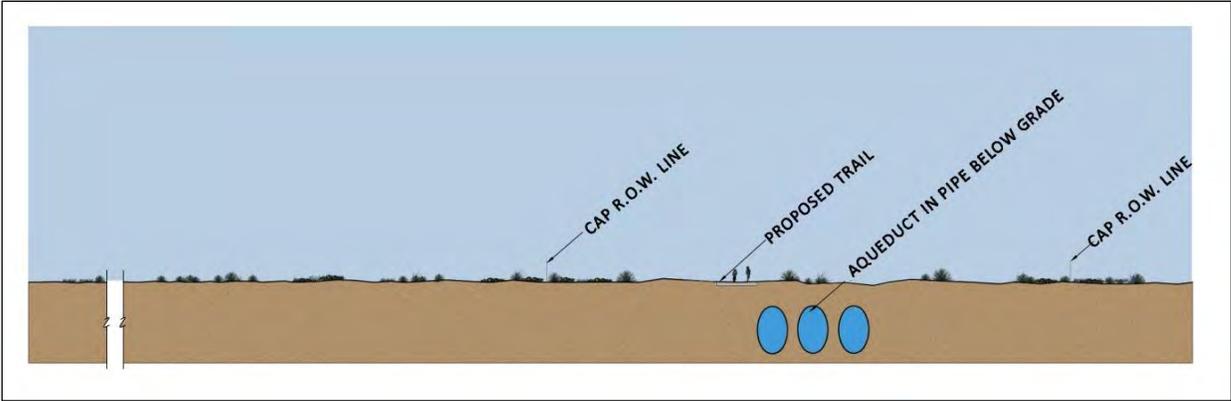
H: Cross-Section PIC-3 – Typical of Mile Post 6.5 to 7.4
